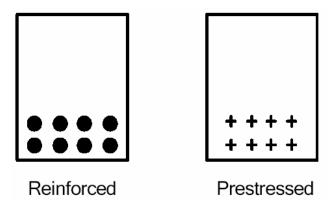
Mild Steel Reinforced Concrete vs. Precast Prestressed Concrete
